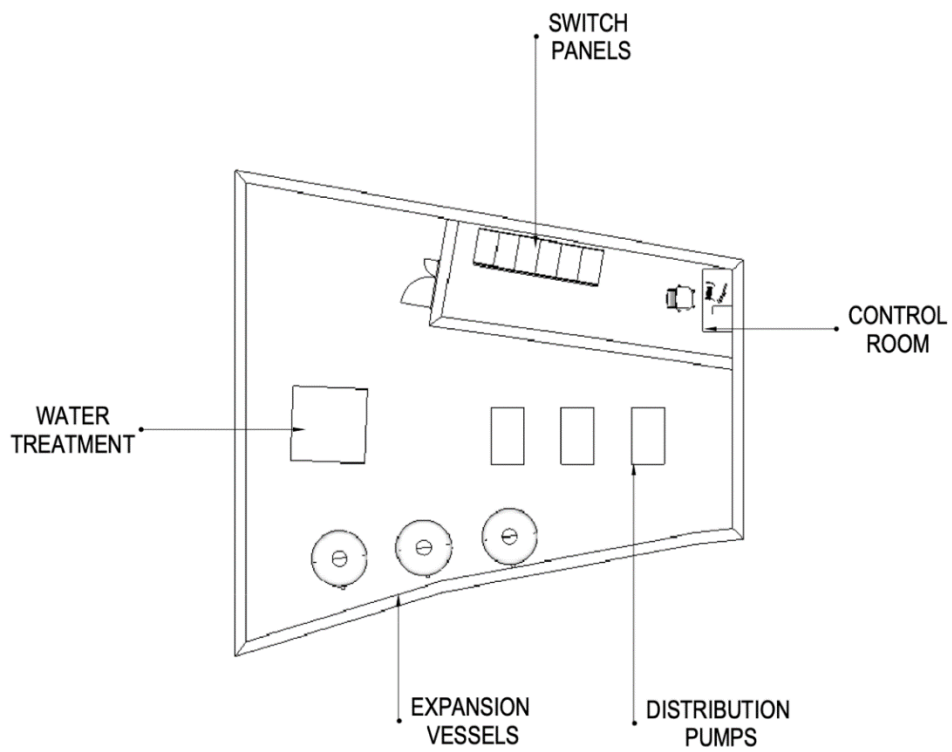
General arrangement drawing of the proposed energy centre – mezzanine floor
